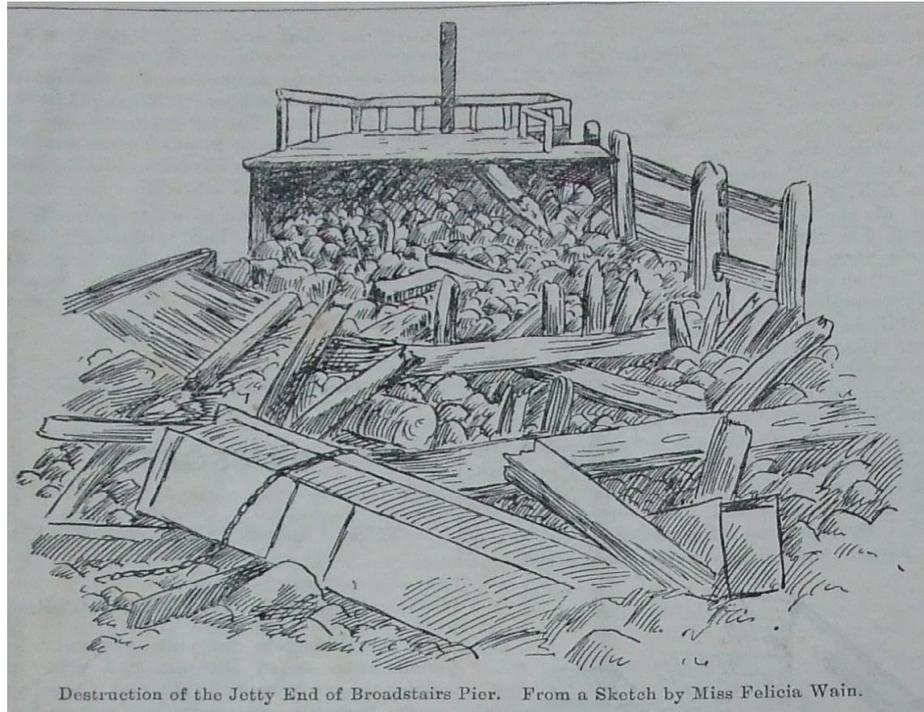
, Sketch of damage at Broadstairs pier in 1897. (source: Keebles Margate and Ramsgate Gazette, Margate Public Library)
